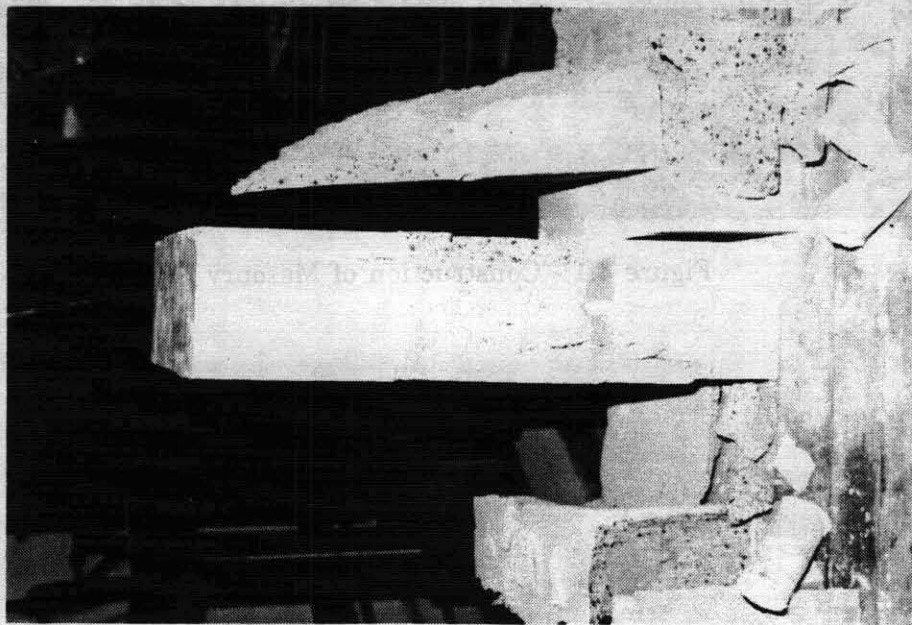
Failure Mode of Concrete Masonry Prism
